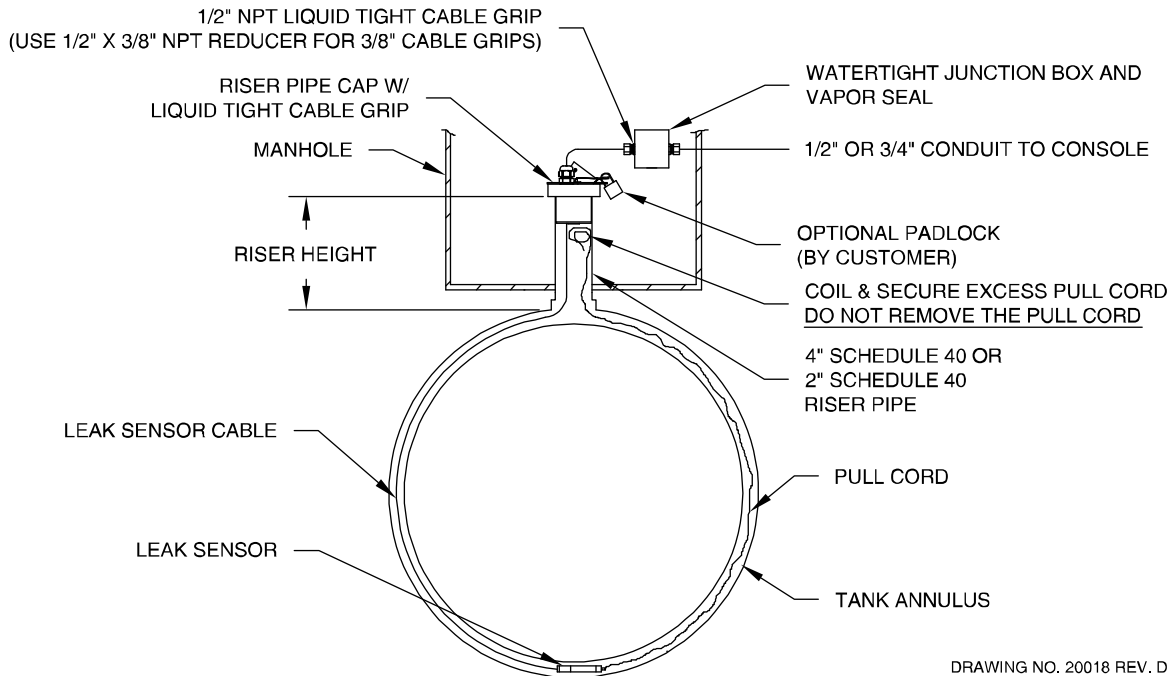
Dry Leak Sensor Installation in Fiberglass Tanks
